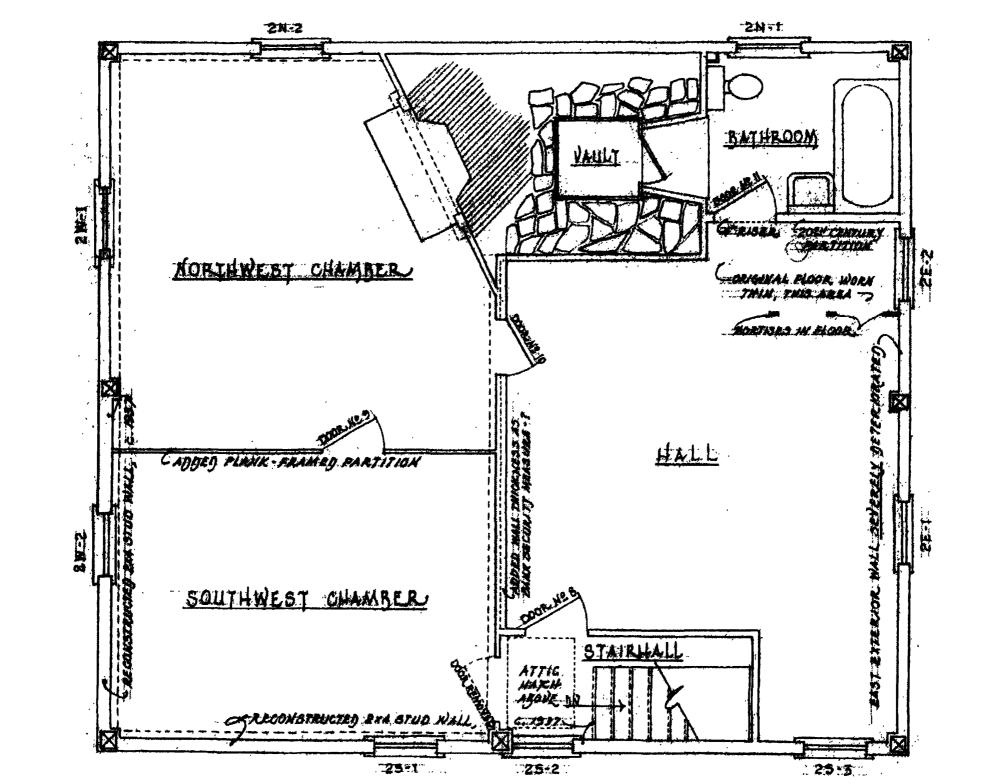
Floor plan of Smithfield Exchange Bank detail from Drawing A-2 Existing Second floor Plan
